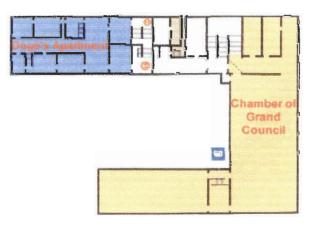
Floorplan of the1st floor of the Palazzo Ducale
